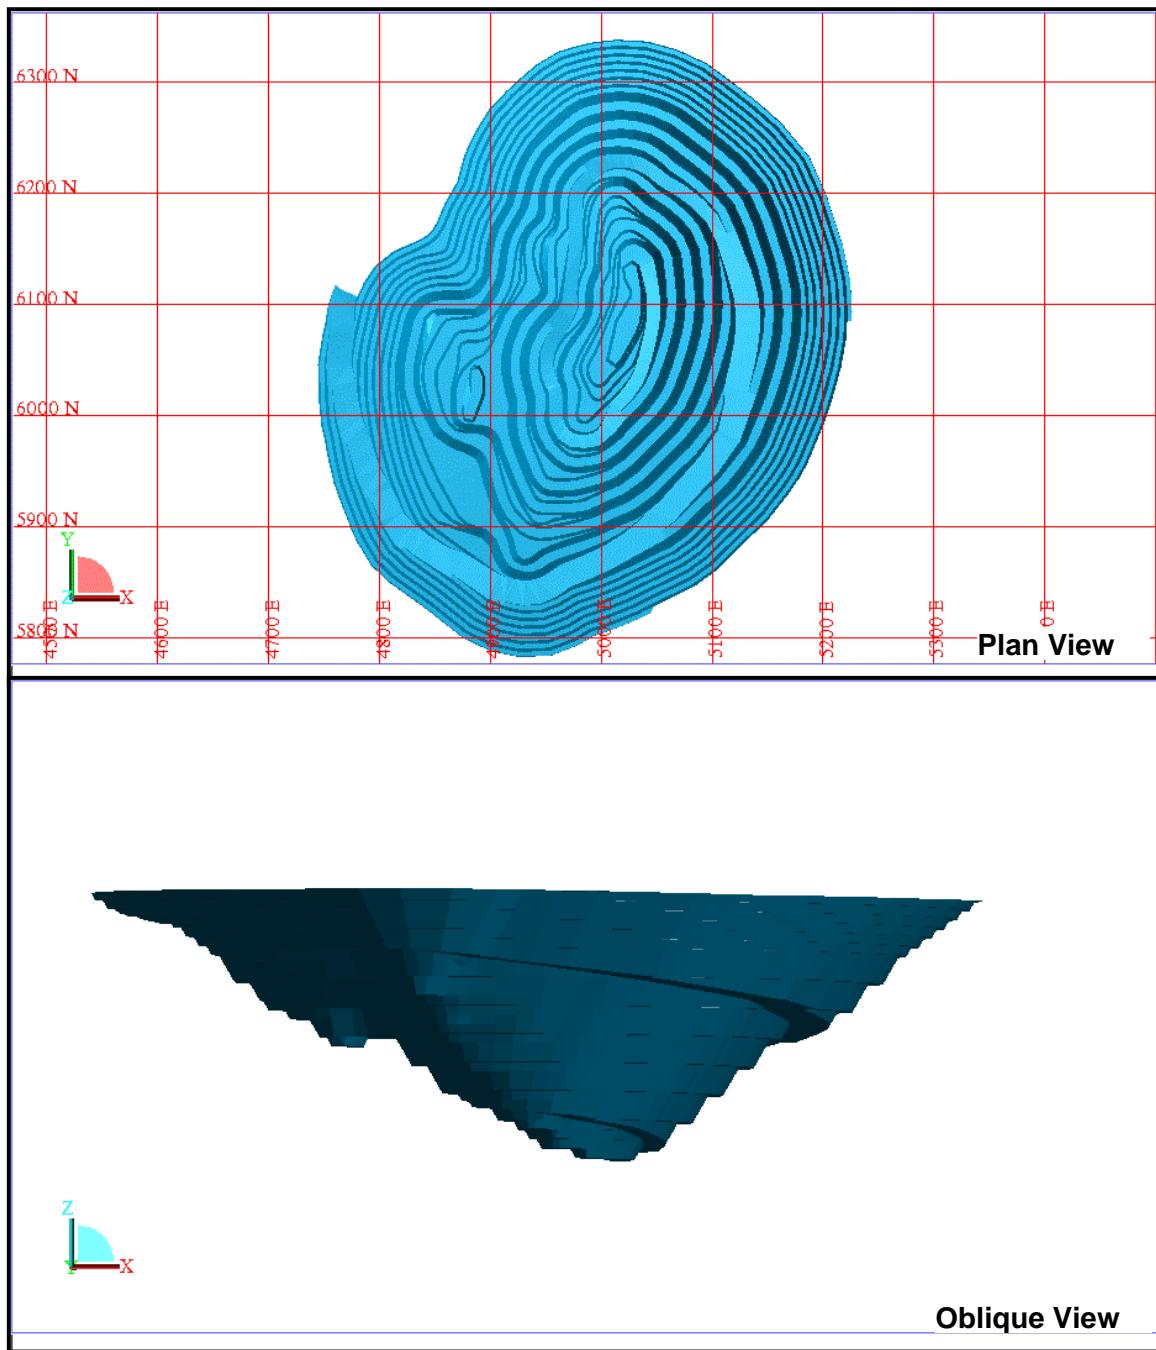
Plan View Showing the 3 Stages of Trilogy Open Pit Mining
